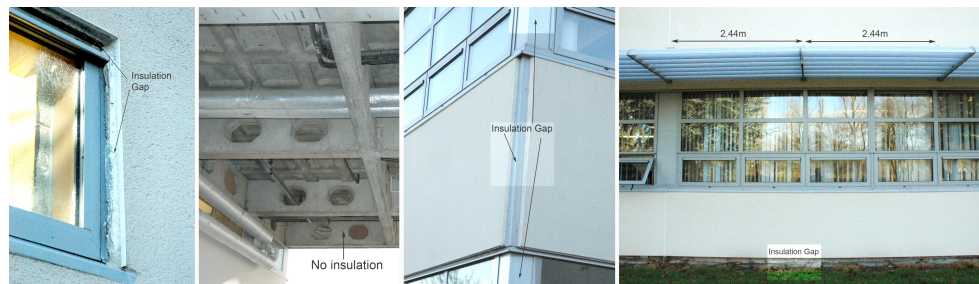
Carlow RTC site inspection Nov 2010. Evidence of insulation gaps. Right-left: 1. Window junctions sill wall 2. Link underpass 3. Building corner spandrel 4. Repeating thermal bridge connection (Ó'Riain 2014).
